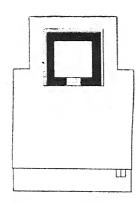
PLAN OF THE OLD TEMPLE, VISAVADA P. 59
